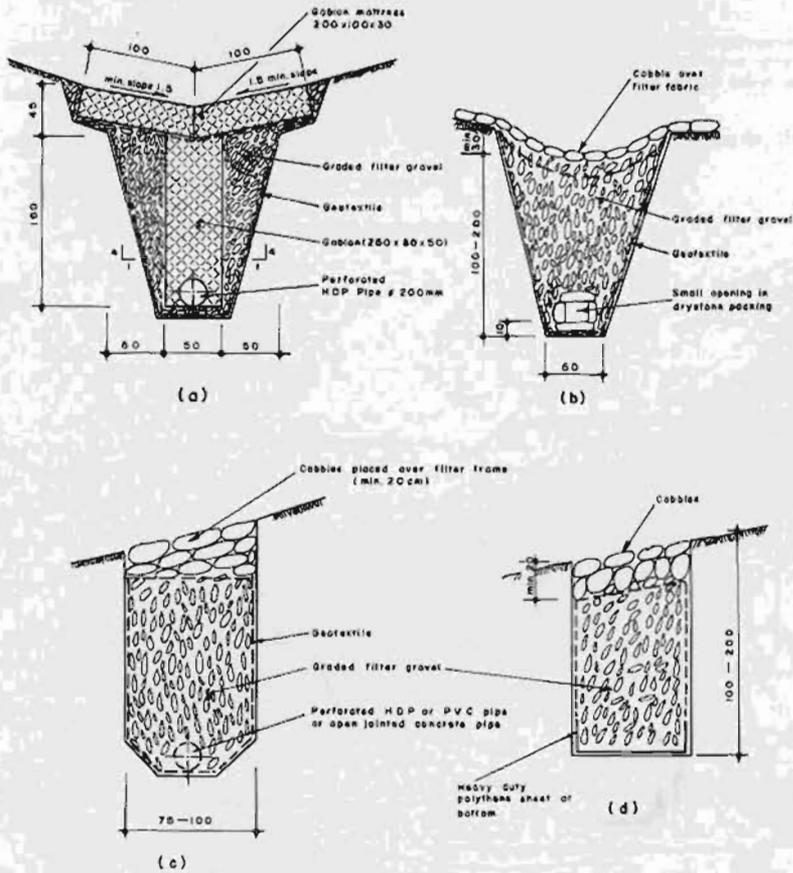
Landslide and cut slope drainage by shallow sub-surface drains
